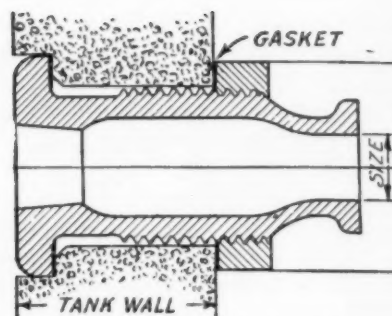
Drawing illustrating how outlets are fastened to the tank.
